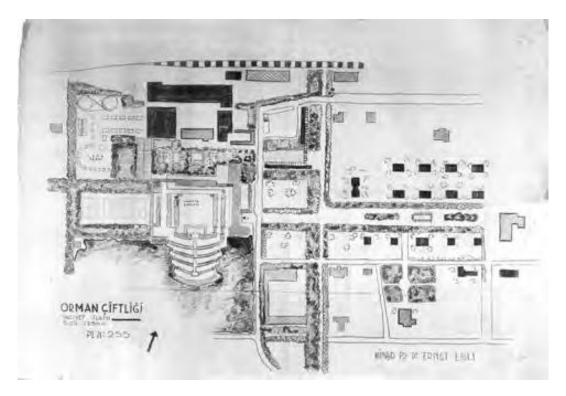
The site plan of Atatürk Forest Farm, Egli, 1936 (Source: TTA, Alpagut, 2010)
